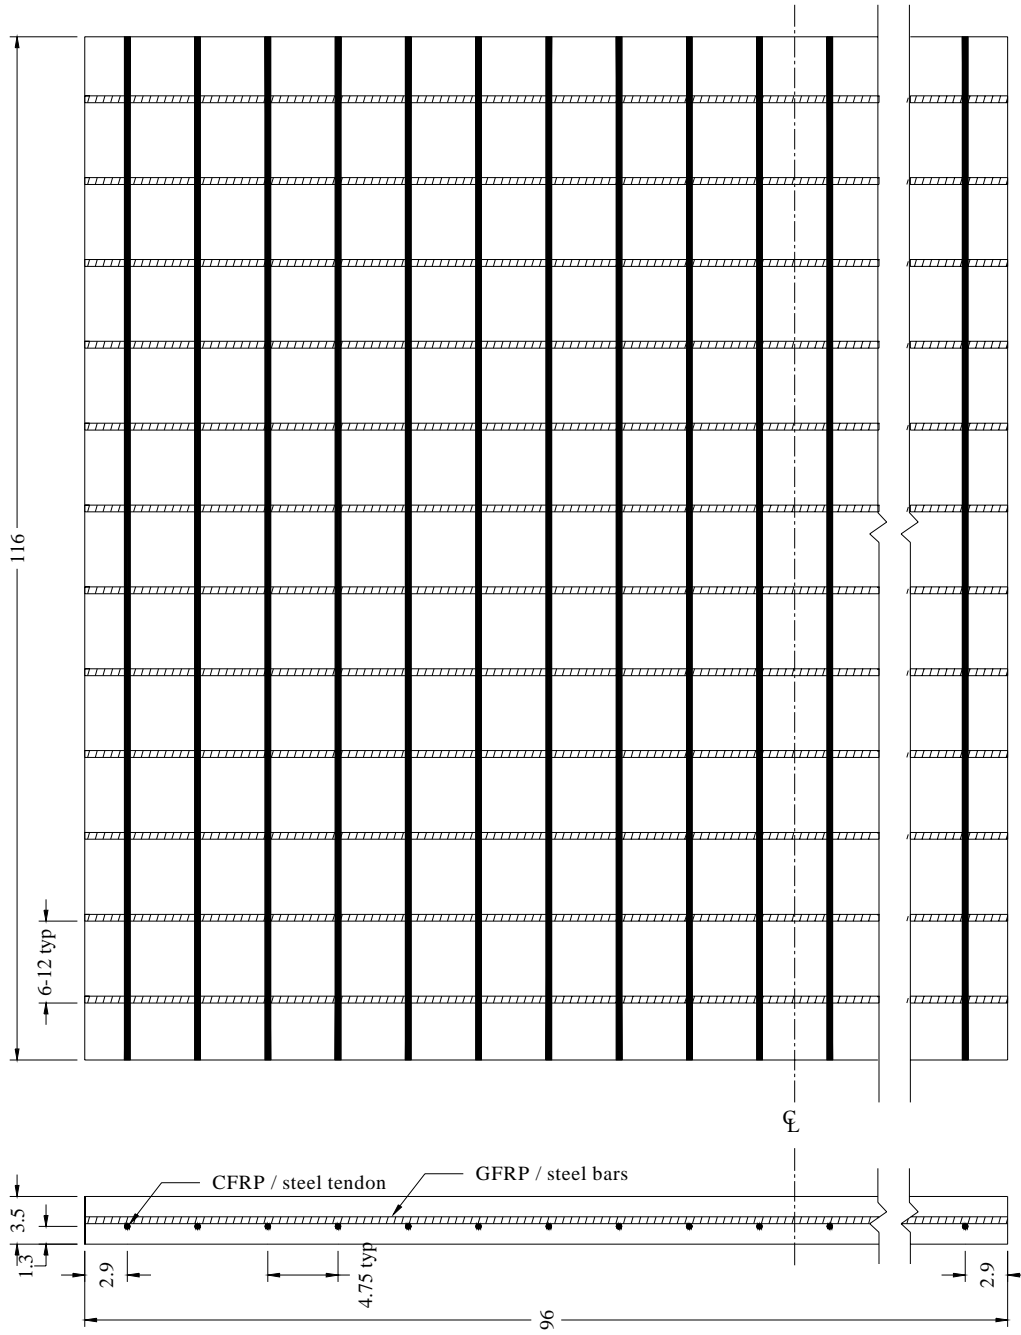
CDOT Panel Cross-Section and Plan View (all values in inches)
